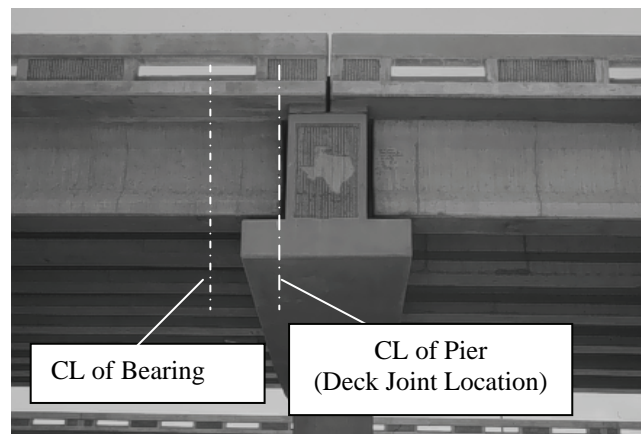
Typical Pier Cap in San Angelo Bridges
